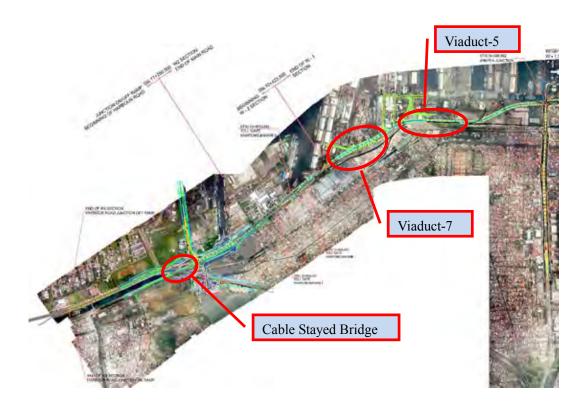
Location of Viaduct-5,7 and Cable Stayed Bridge
